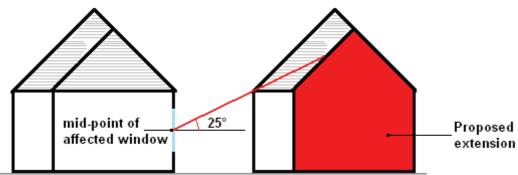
Fig A: Proposed extension may result in loss of daylight to adjacent window of a habitable room
